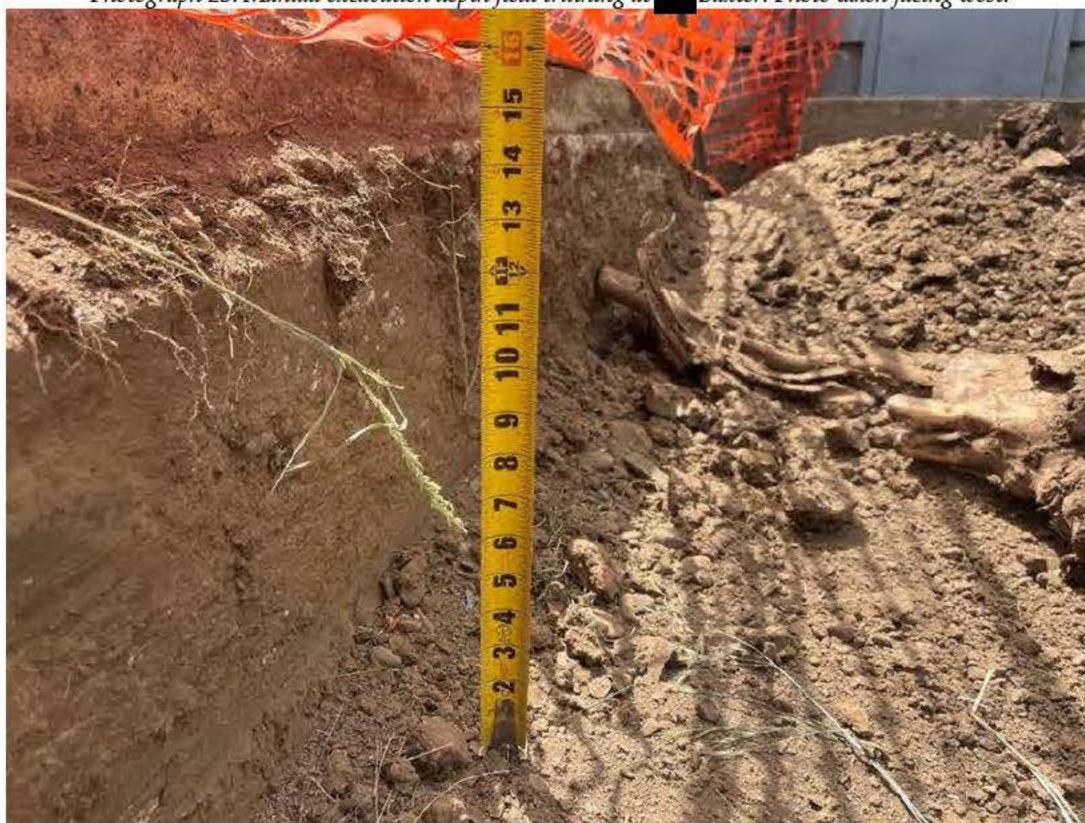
Footing excavation at [REDACTED] Baxter. Photo taken facing southwest.
